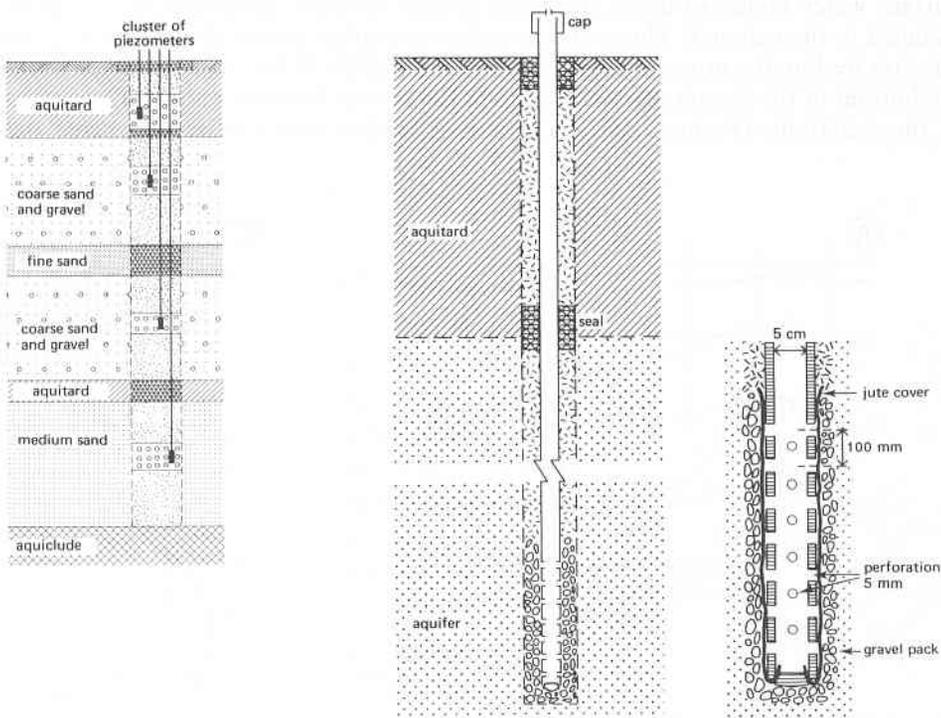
Multiple piezometer well and the cross-section of a piezometer
